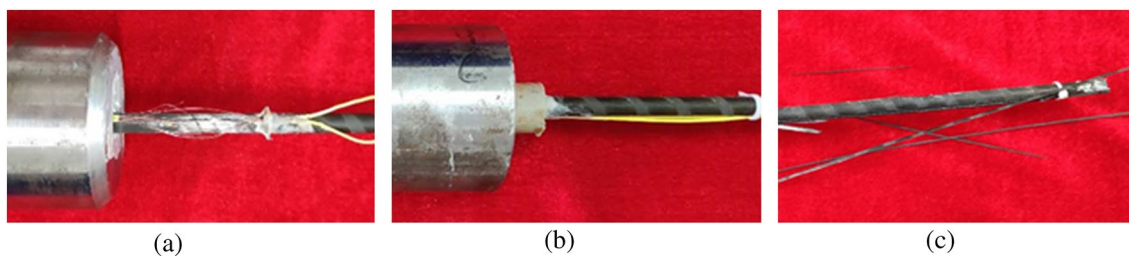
Three failure modes a pull-out failure b partial debonding failure c tensile fracture
